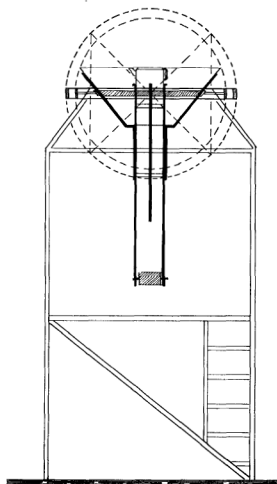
The mounting of gauge and wind shield (Gauge No. 20).
